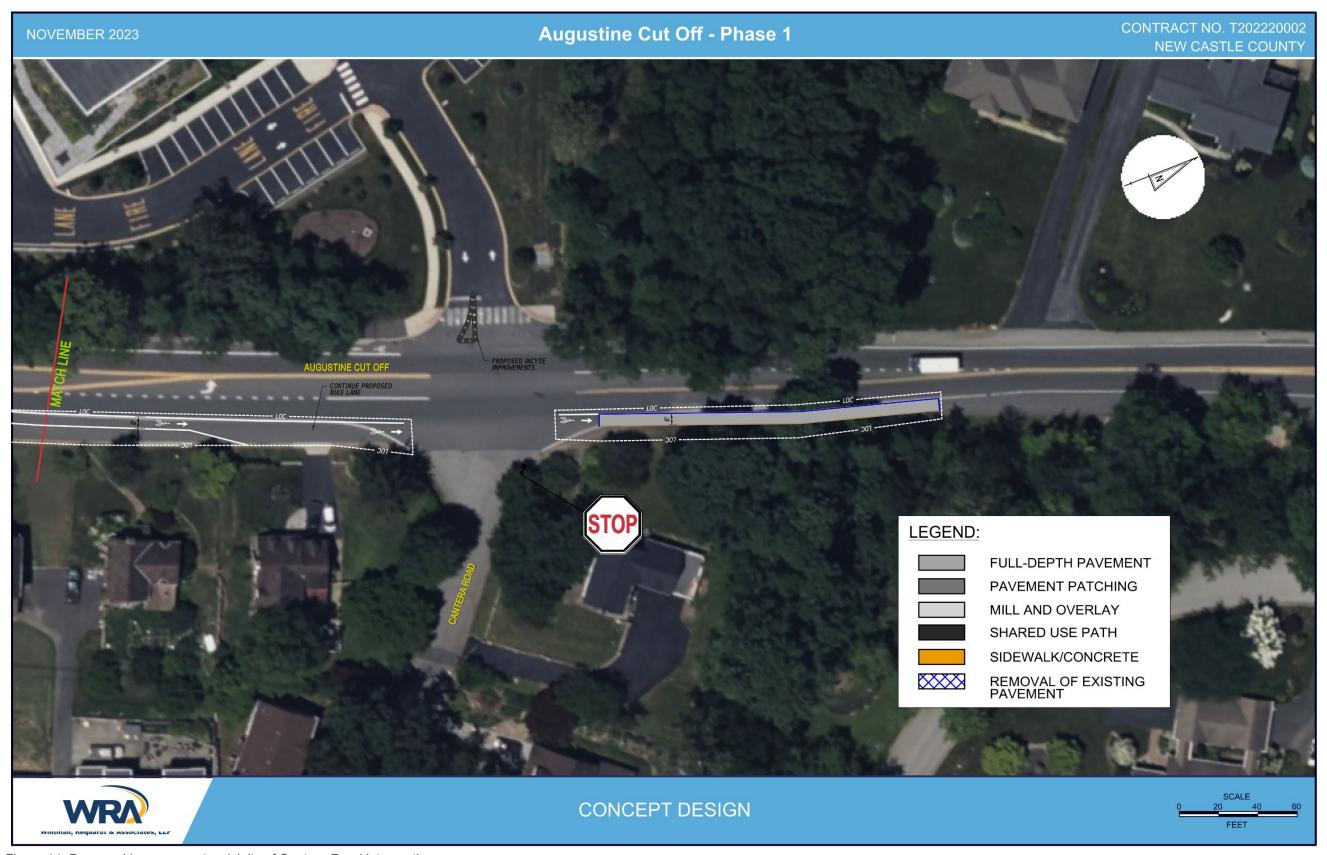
Proposed improvements, vicinity of Cantera Road intersection
